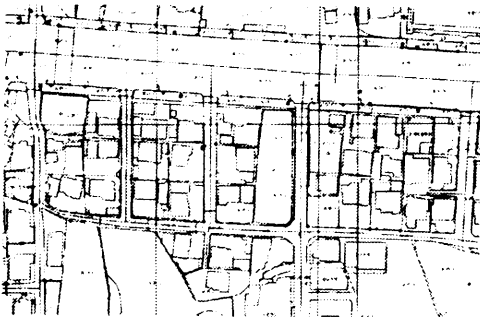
A siteplan of house in improvement village (Located Sam-Yang-Dong)
